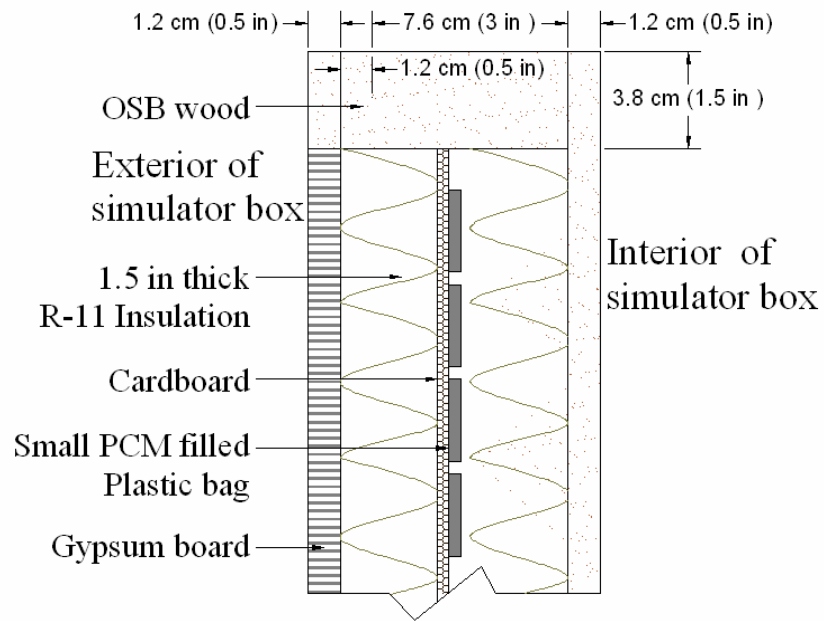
PCM arrangement inside the wall cavity for the second series of tests
